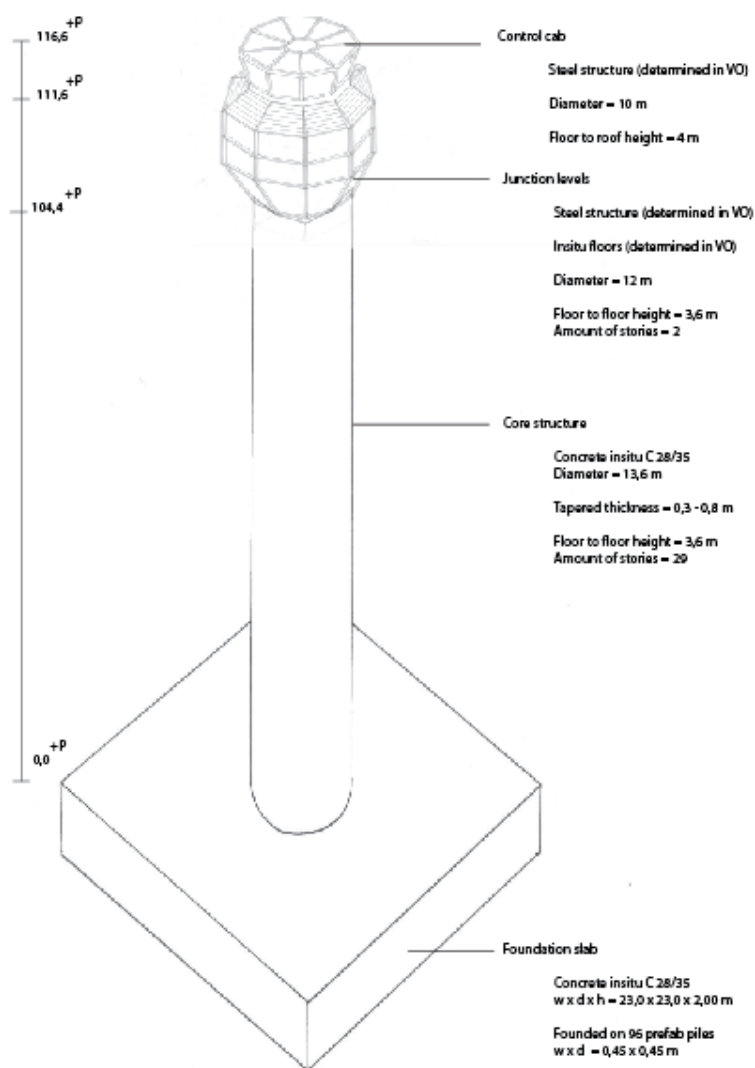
Concept design Istanbul airport, concrete core in-situ
